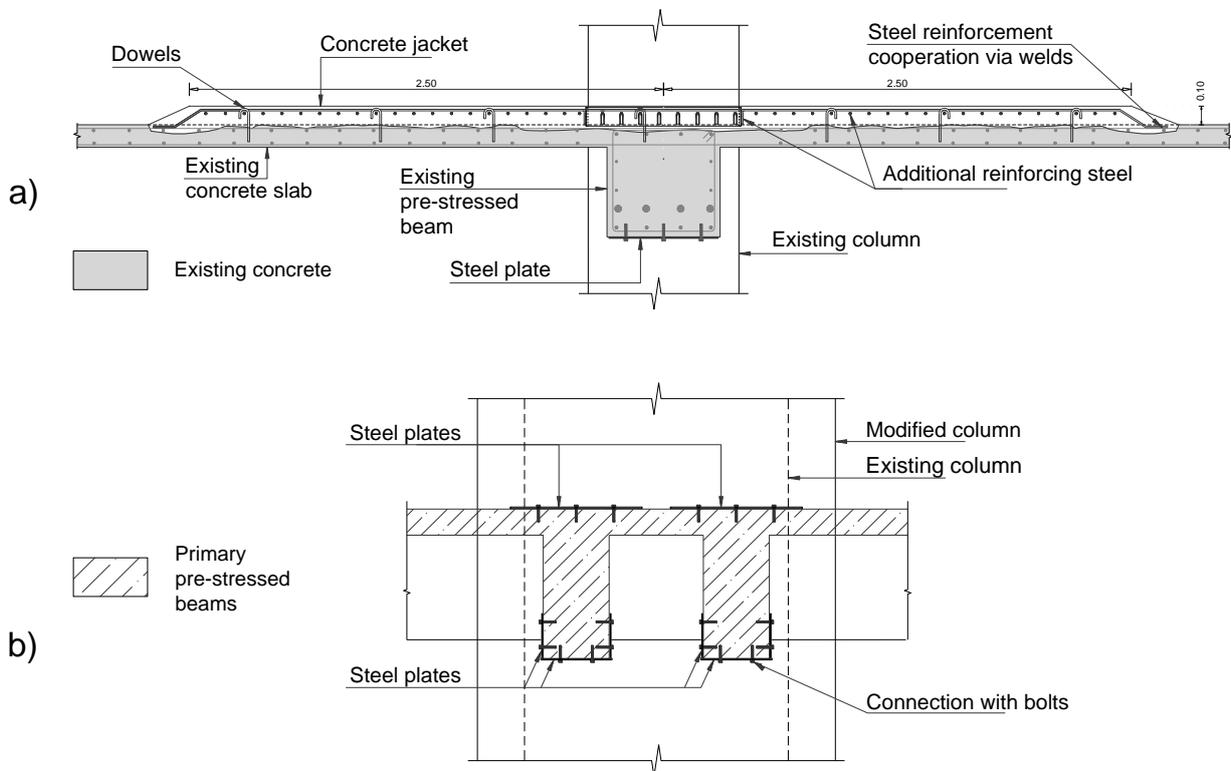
Cross-sections of pre-stressed concrete beams of a) first floor and b) ground floor after strengthening modifications
